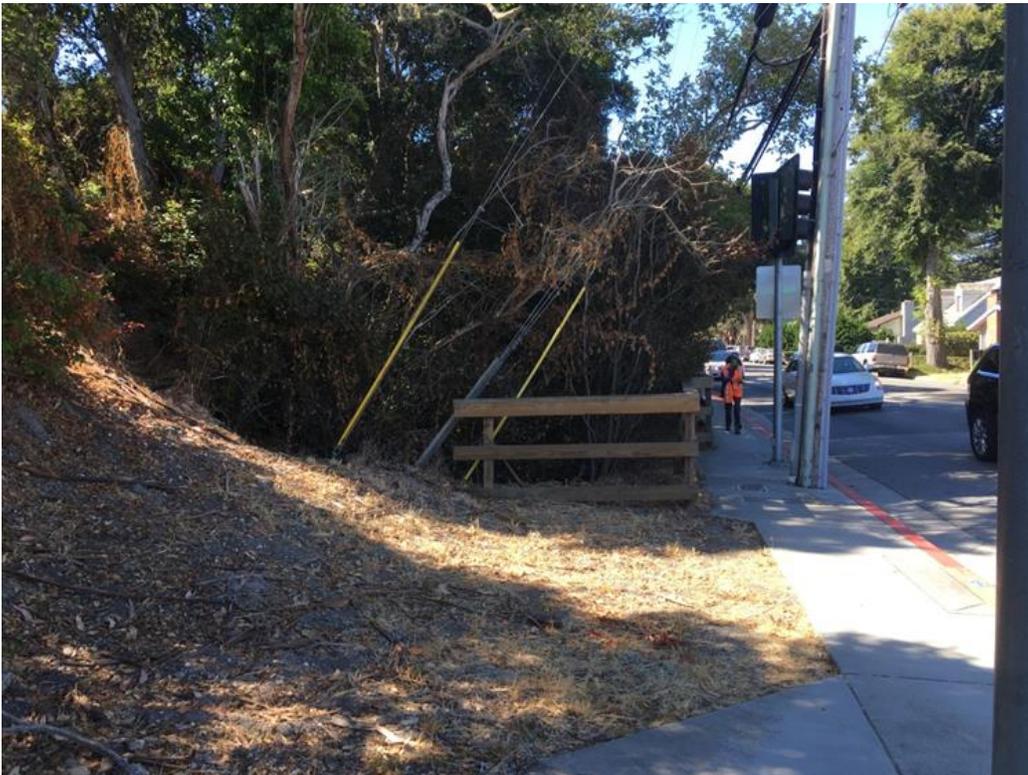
Site 3, Culvert outlet, facing upstream (west).
